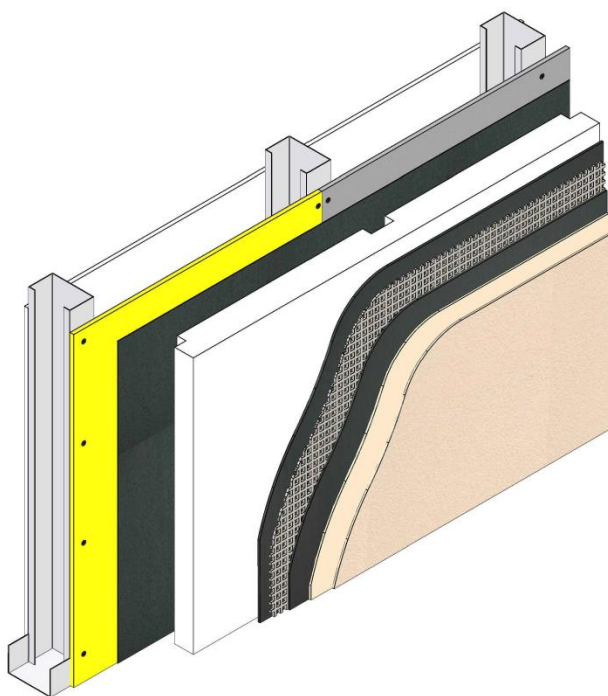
“Senerflex®” over glass-mat gypsum or cement board over steel framing
